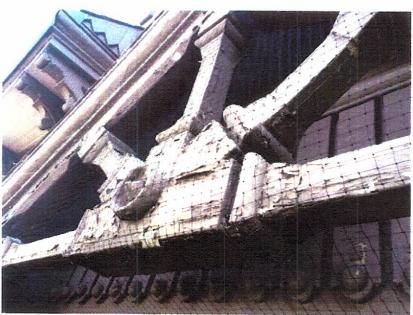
West elevation tower, decorative element paint failure, substrate in good condition.
